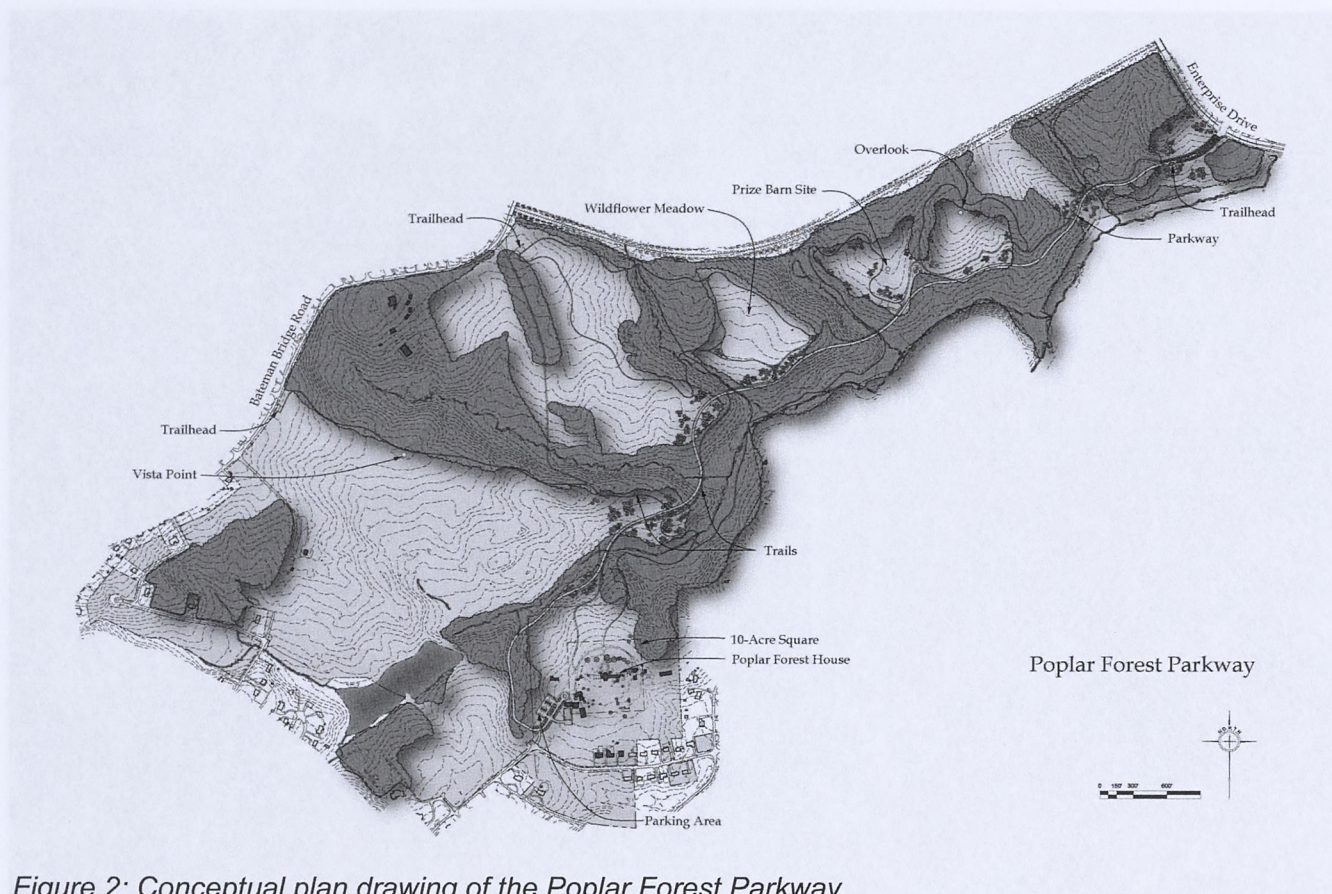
Conceptual plan drawing of the Poplar Forest Parkway.
